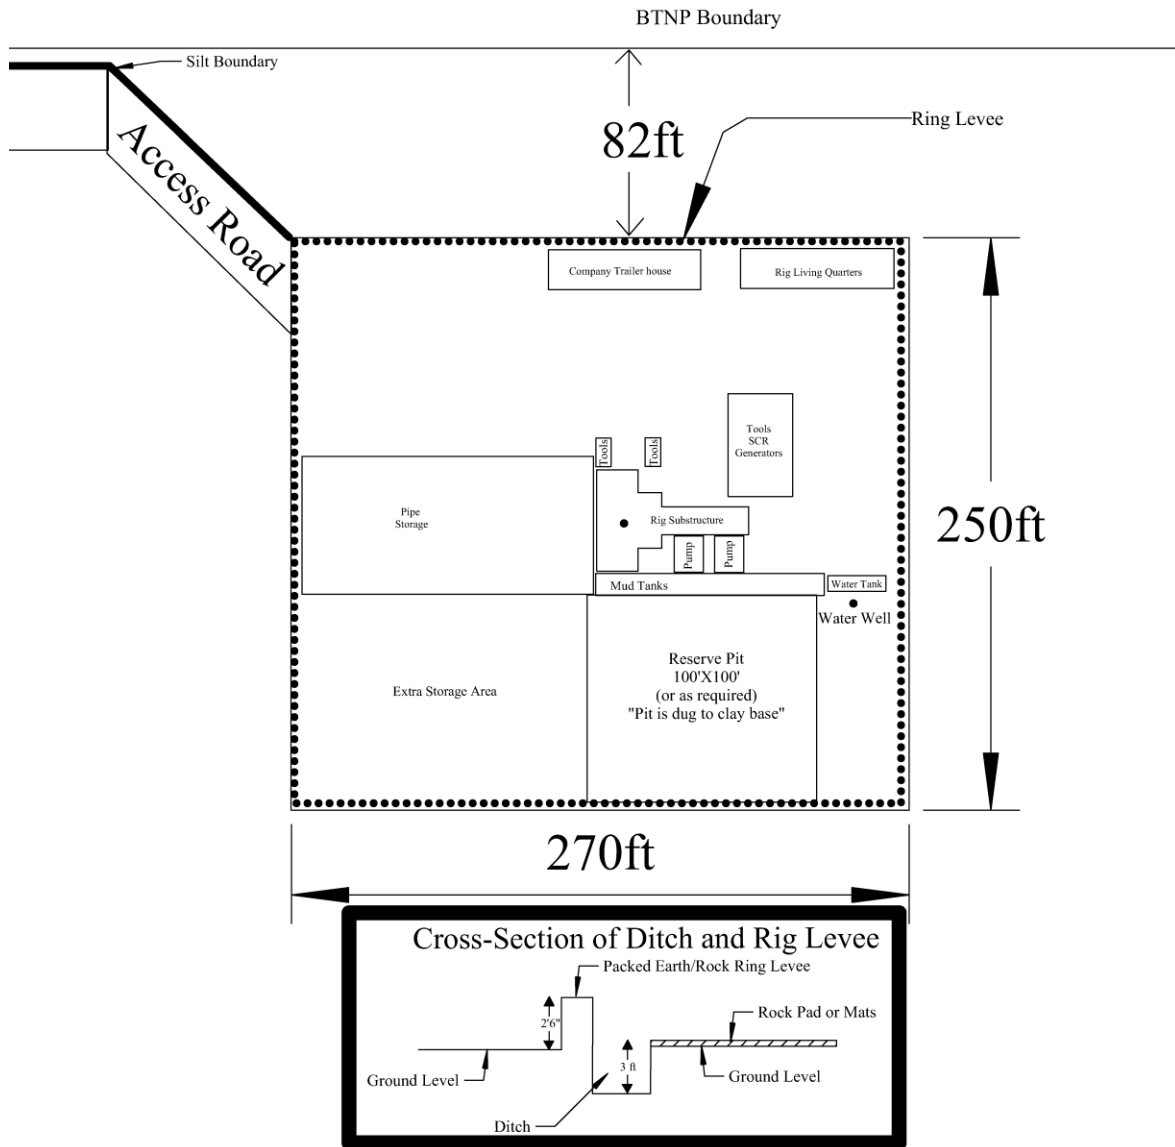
Proposed Baptist #1 Well Drilling Facility.
